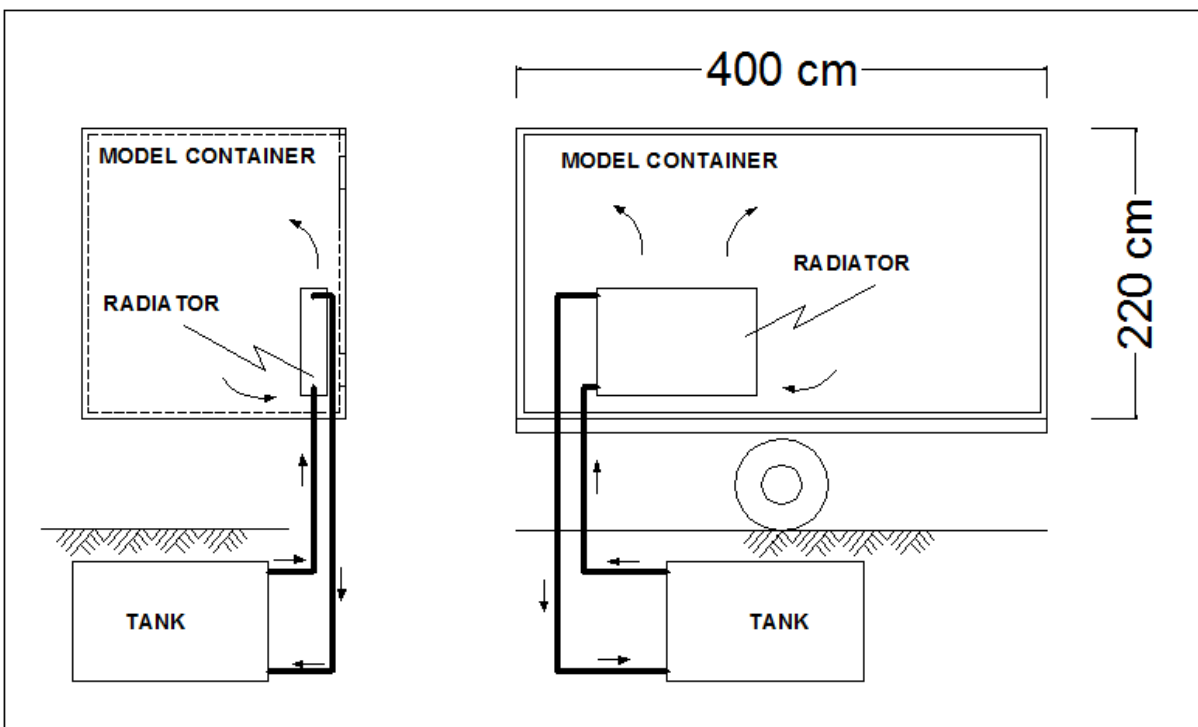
Water Circulation in the Trombe Wall System When the Sun was not Shining
